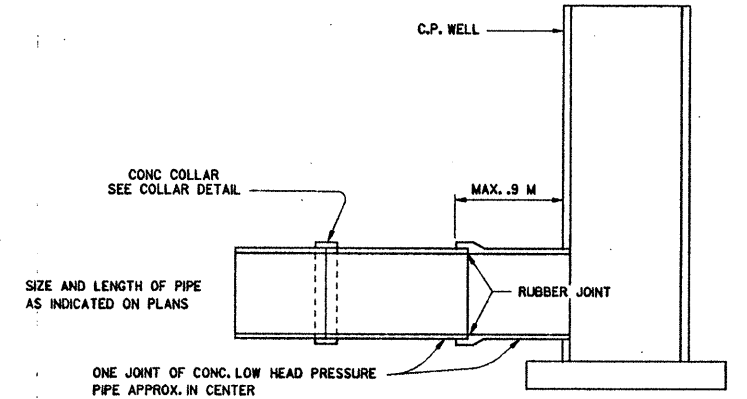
DETAIL FOR CONC. COLLARS ON PIPE SIPHONS
